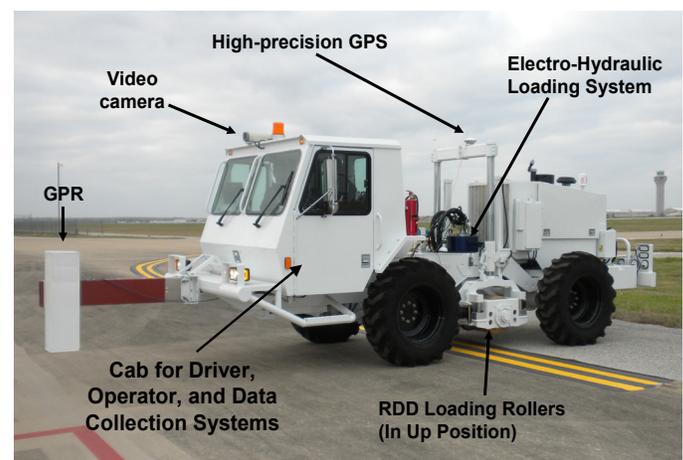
Photograph of the Total Pavement Acceptance Device Preparing to Evaluate a Jointed Concrete Pavement at the TxDOT Flight Services Facility.
